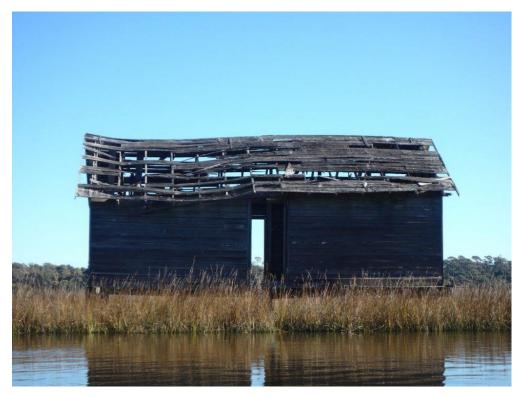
West face of boat house (Photo by Tyler Ball, ECU).
